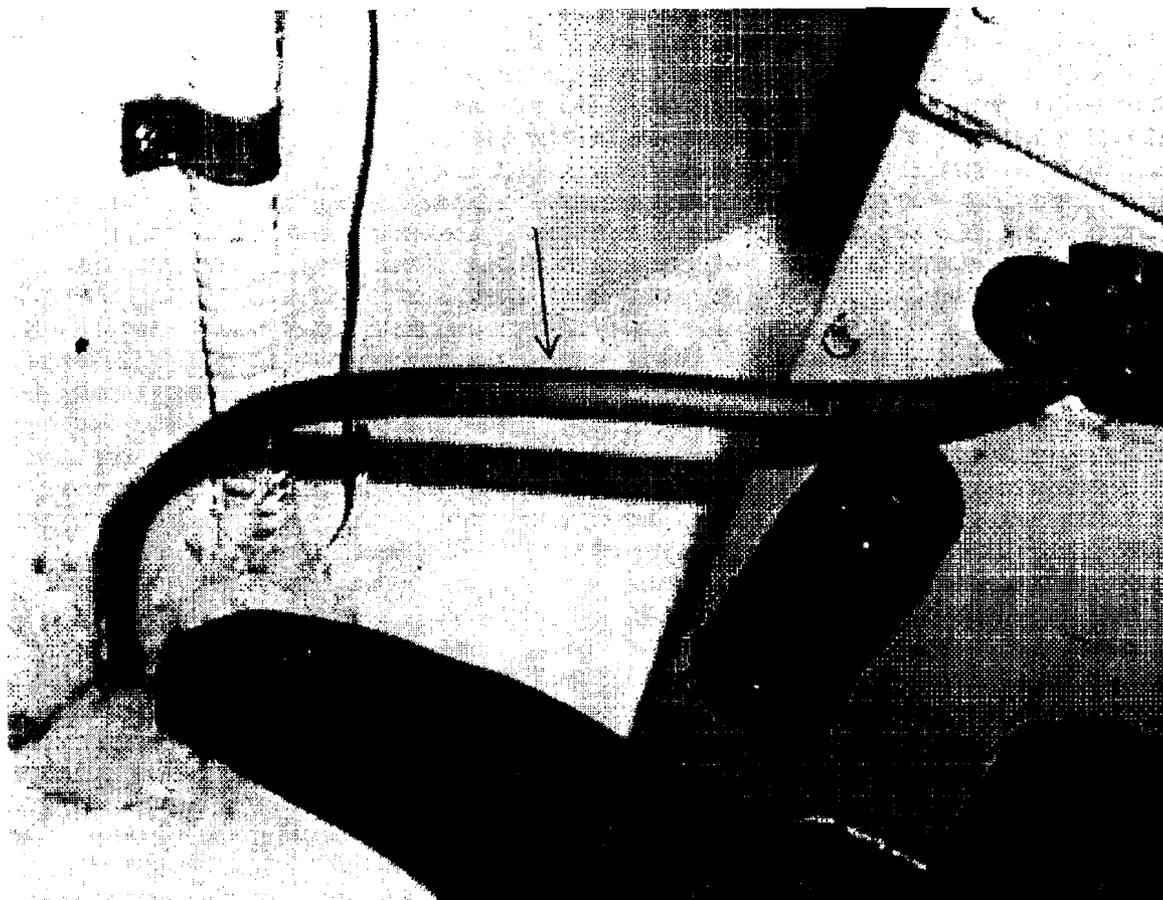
shows a blackening copper pipe attached to the air conditioning unit on the second floor.
